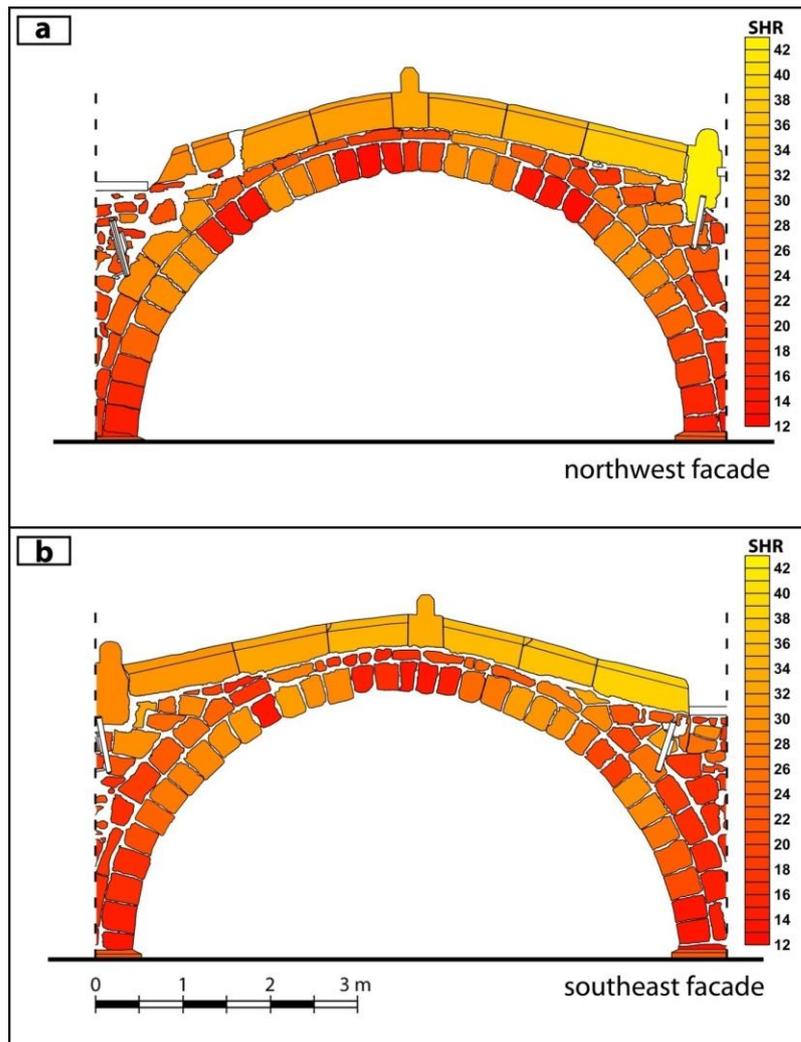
SHR distribution maps of the building stones in the Mısırlıoğlu Bridge, a) northwest facade, b) southeast facade.
